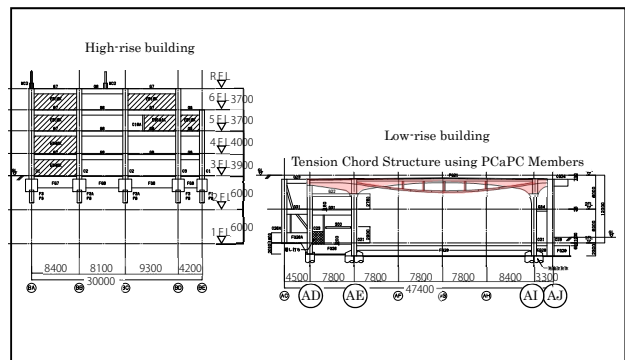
Framing elevation at B5-AB and framing elevation at AJ (b-b')
